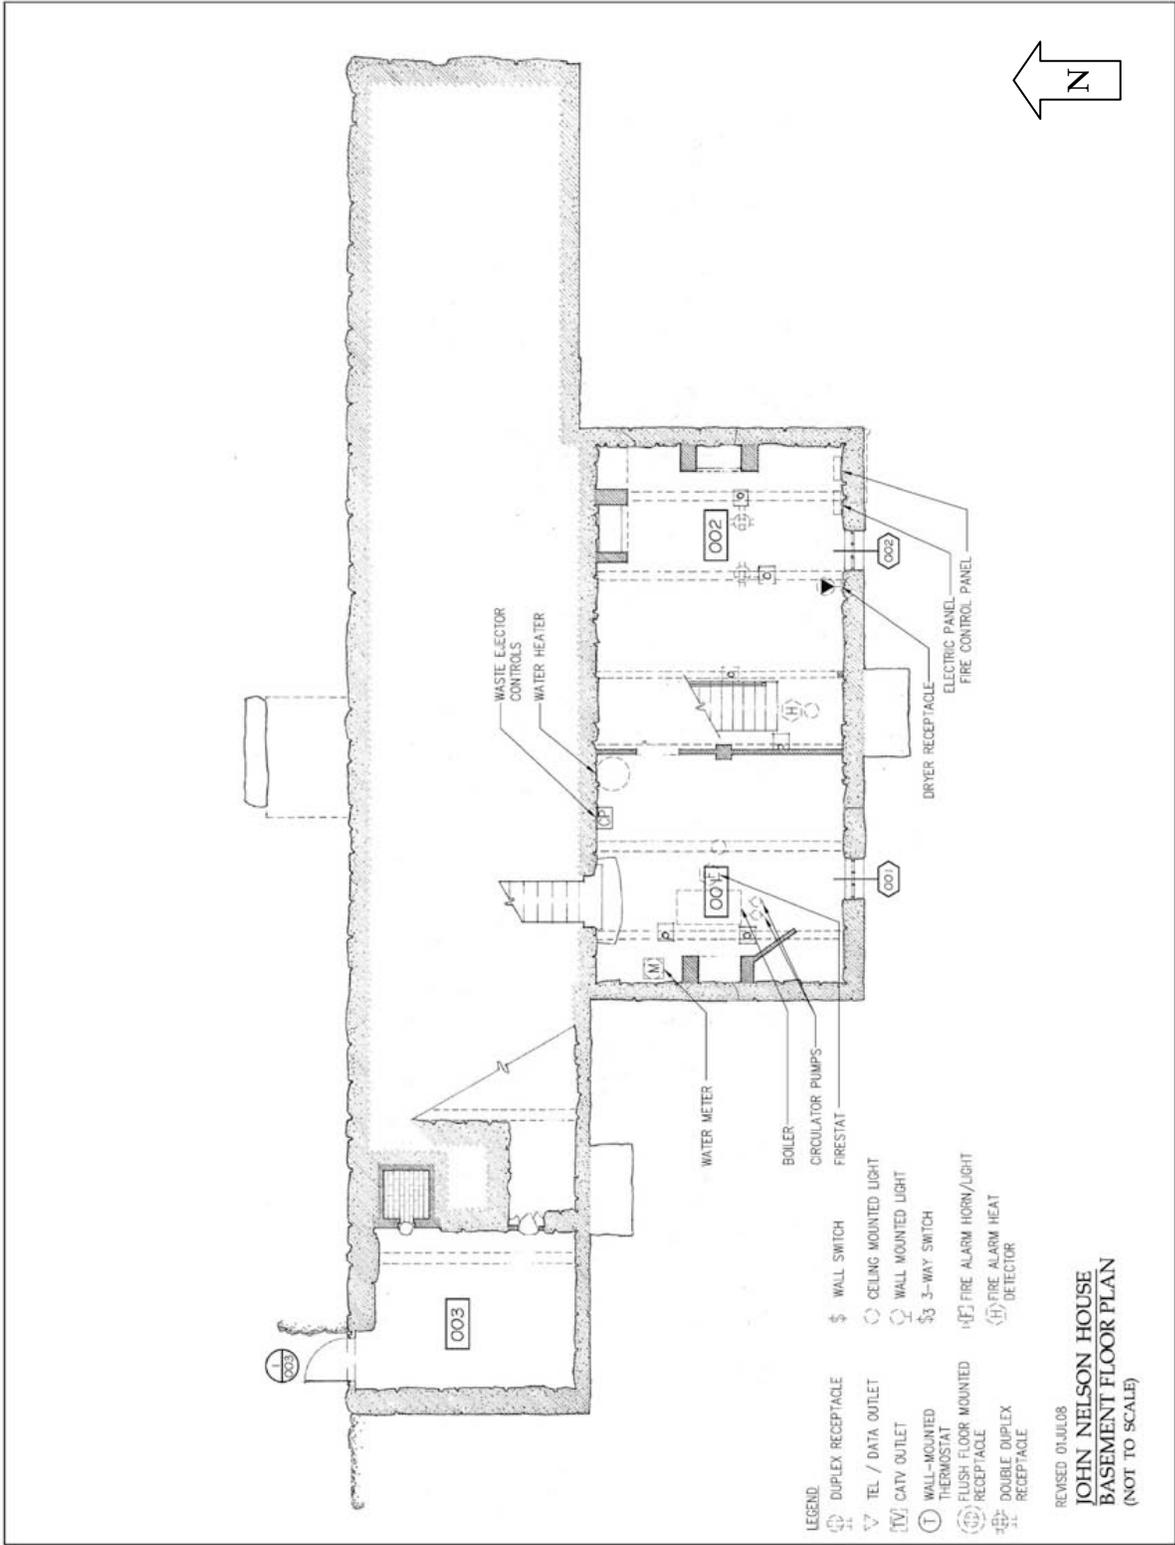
John Nelson House, basement plan with room, doorway, window, and utilities key.
